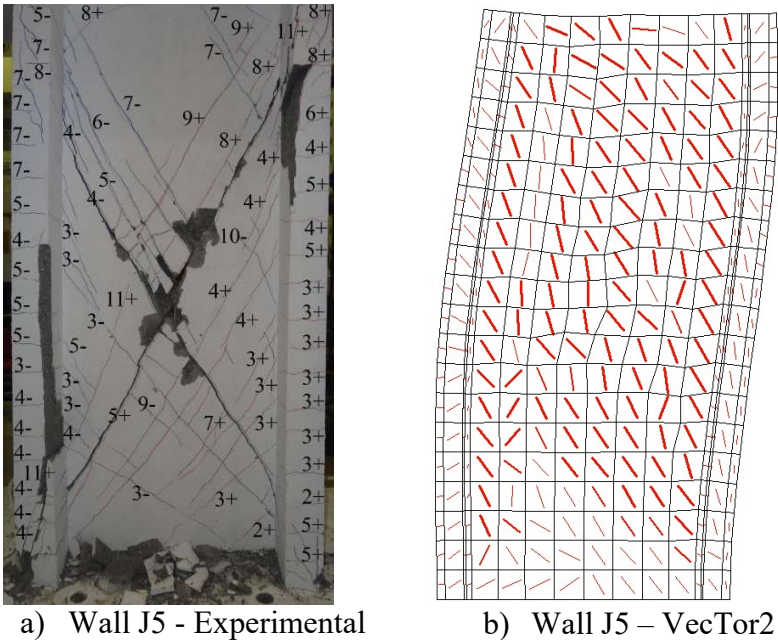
Cracking patterns and failure modes for walls tested by Teng & Chandra (2016)
